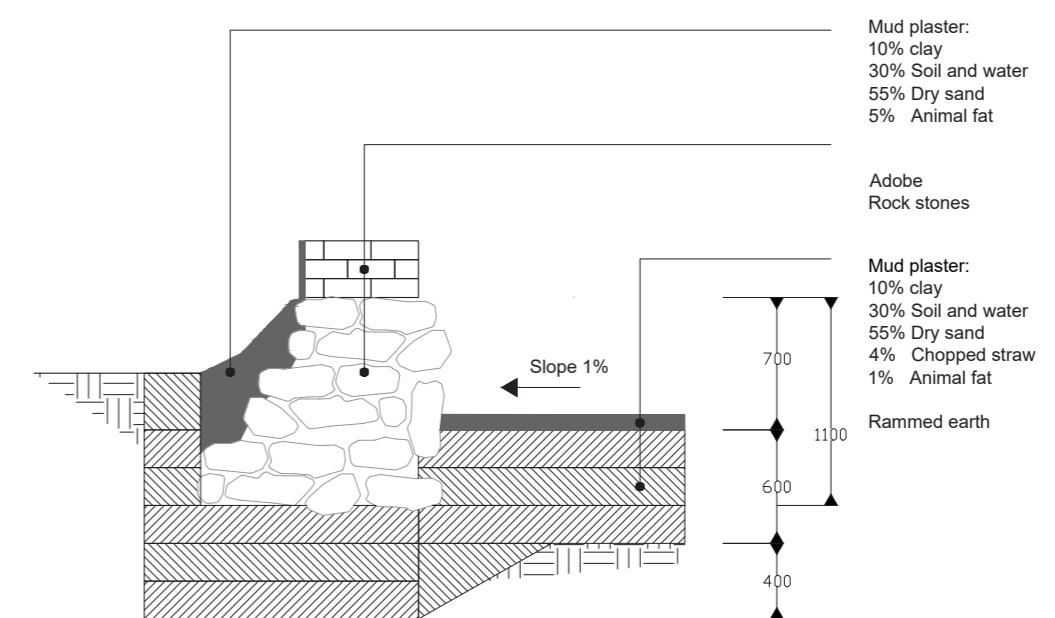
Section of the foundation and an exterior wall which is typical for every building in the complex. source: own
